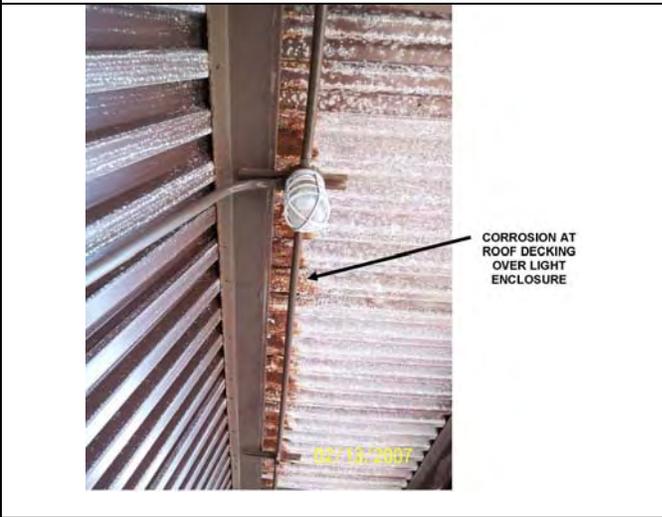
Roof metal deck over roof framing supports at NE movable stand.
